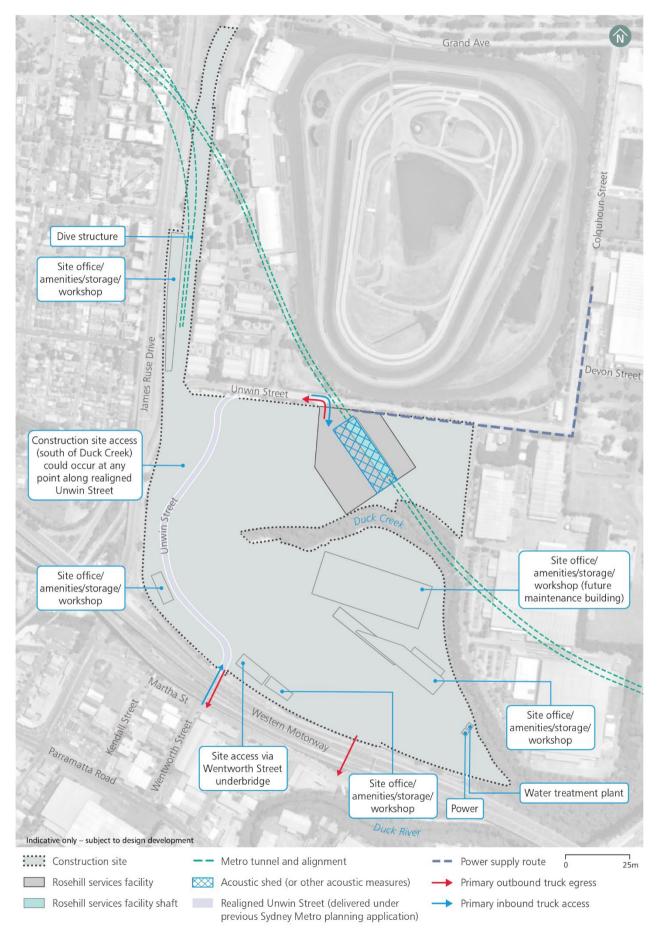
Indicative construction site layout – Clyde stabling and maintenance facility and Rosehill services facility
